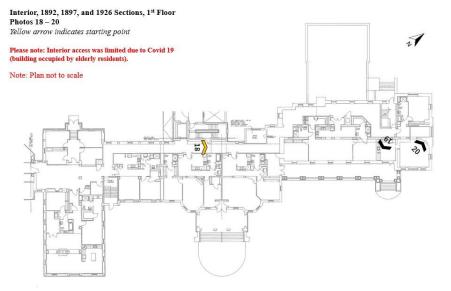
Interior, 1892, 1897, 1926 Sections, 1st Floor Photo Key (Photos 18–20)
